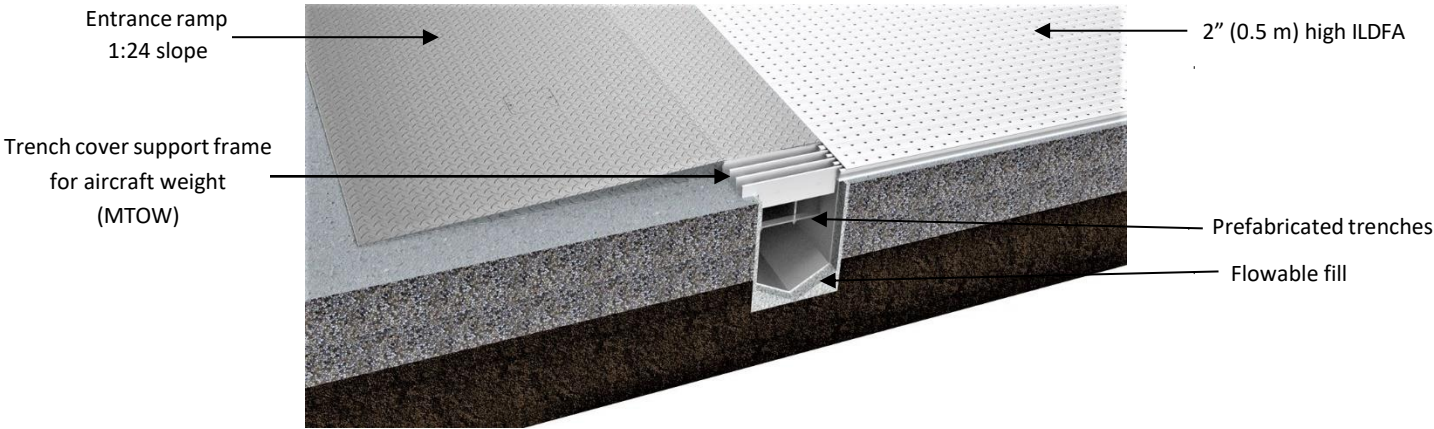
Render of ILDFA installed on hangar slab with prefabricated trenches and entrance ramp for retrofit projects.
